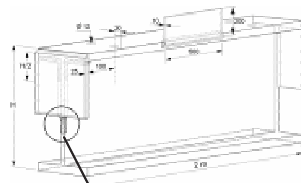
Weld bead added in critical area below welded half cover plate
